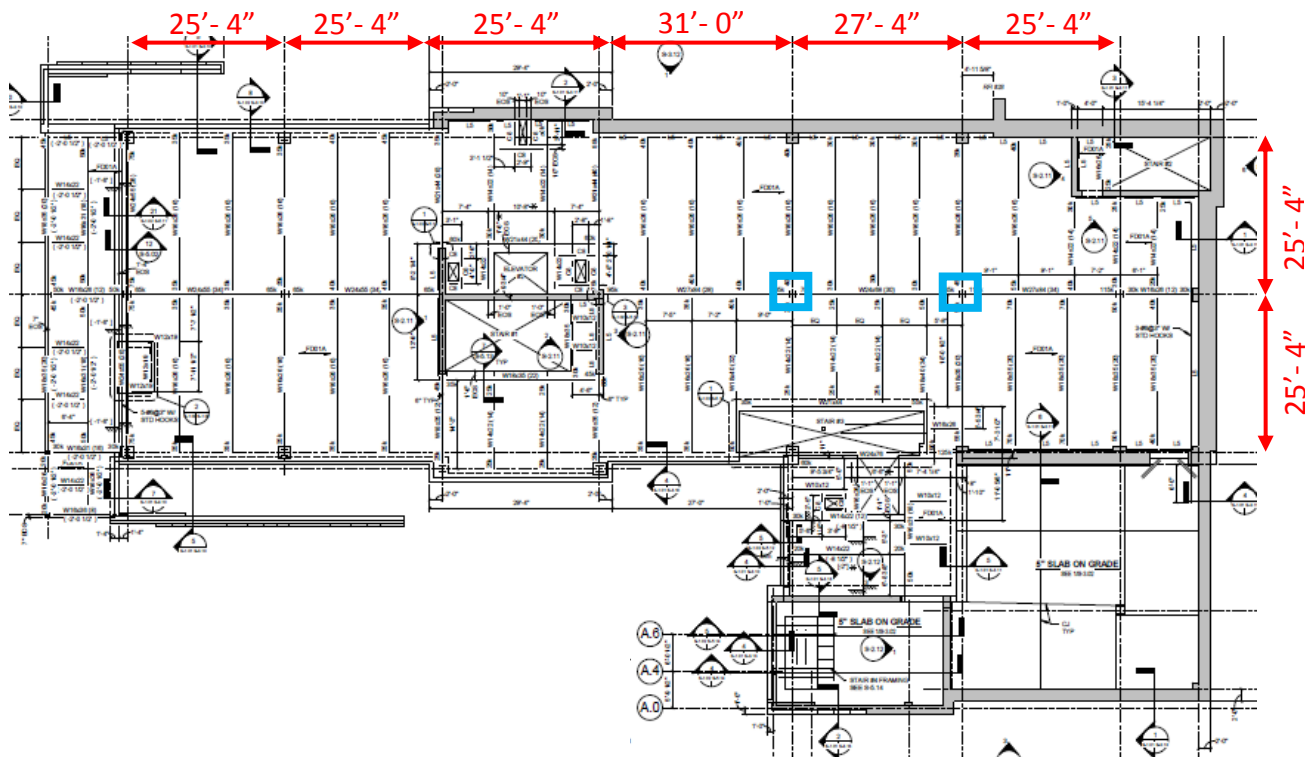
Level 2 Showing Location of W12x170 Columns (Sheet S-1.02)
